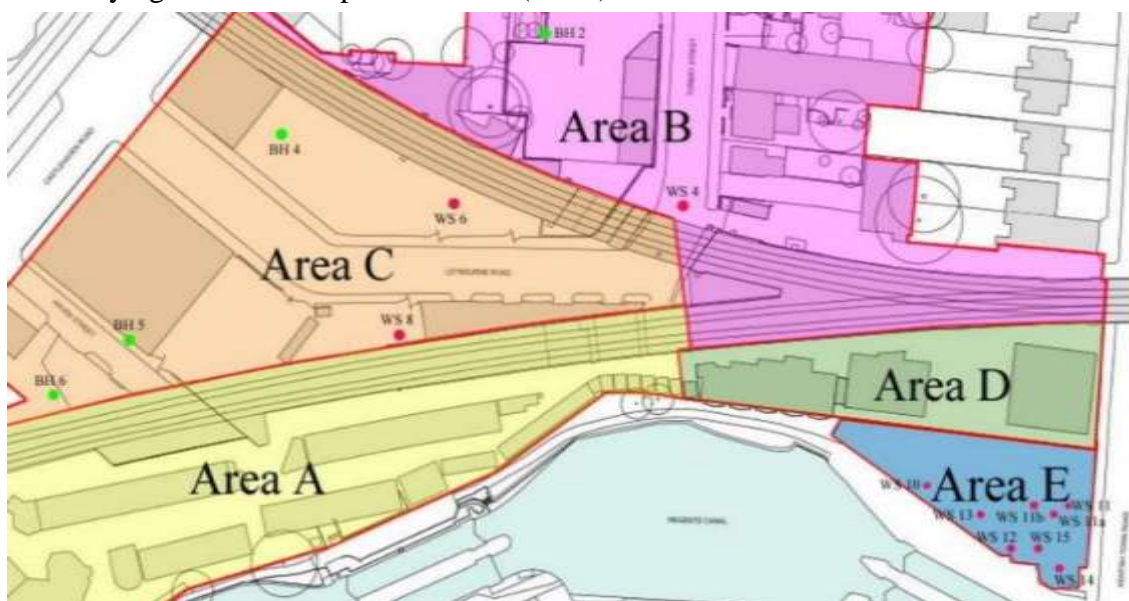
Site plan showing location of boreholes (green) and window samples (pink).
